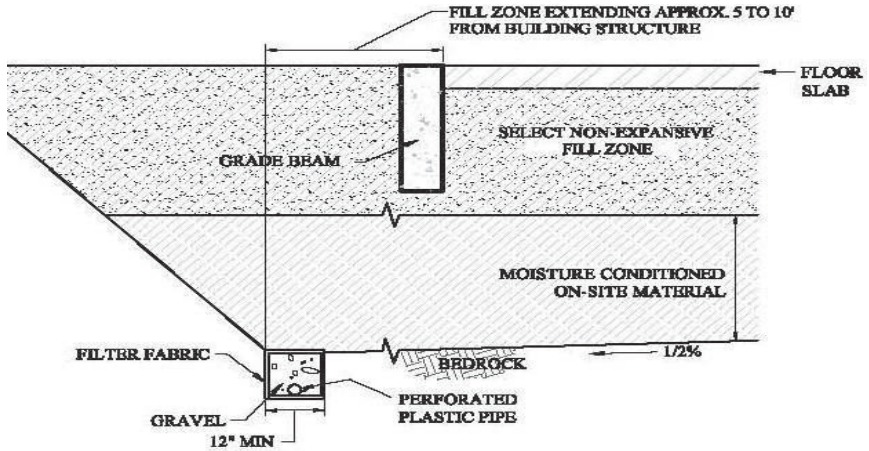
CONCEPTUAL DETAIL UNDERDRAIN SECTION
